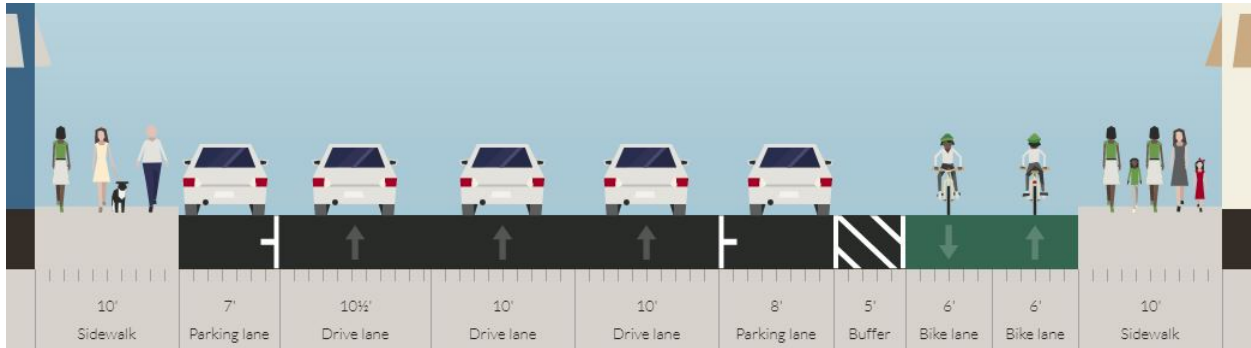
Typical Cross Section of Folsom Street between 11th and 10th streets, looking east
